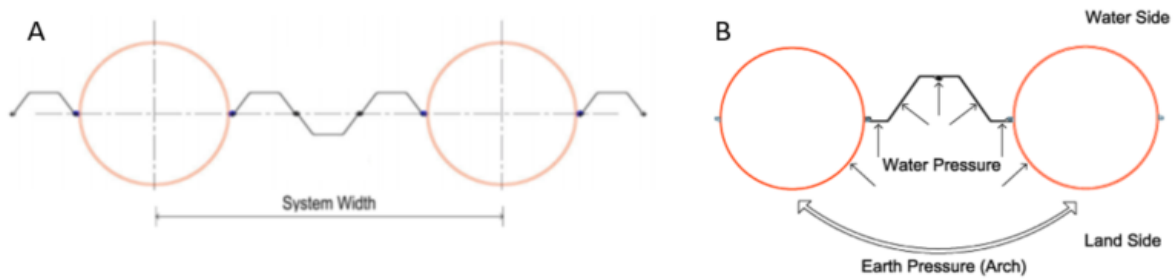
A) combined wall example, B) impression of arching effect near tubular piles
